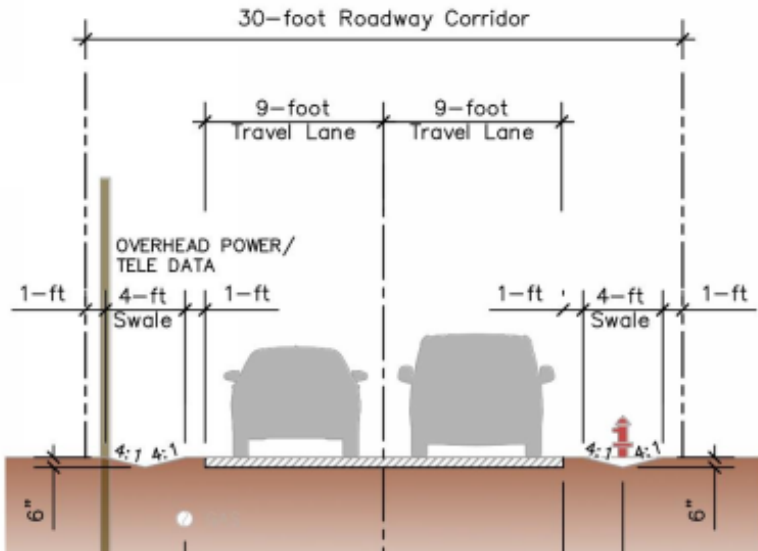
Rural Local Road, 50-Foot Right-of-Way
